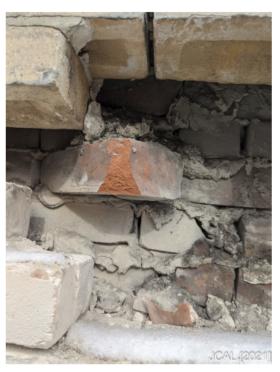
Cavity and Diagonal Tying Brick [JCAL (2021)]
